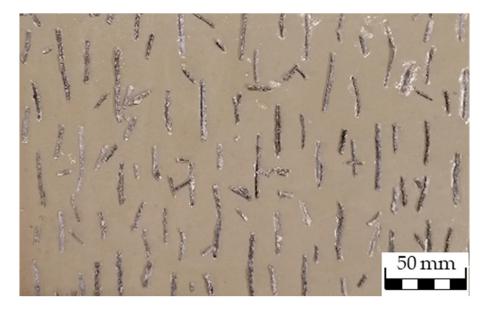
Recycled rCF yarn pieces as reinforcement in concrete.
